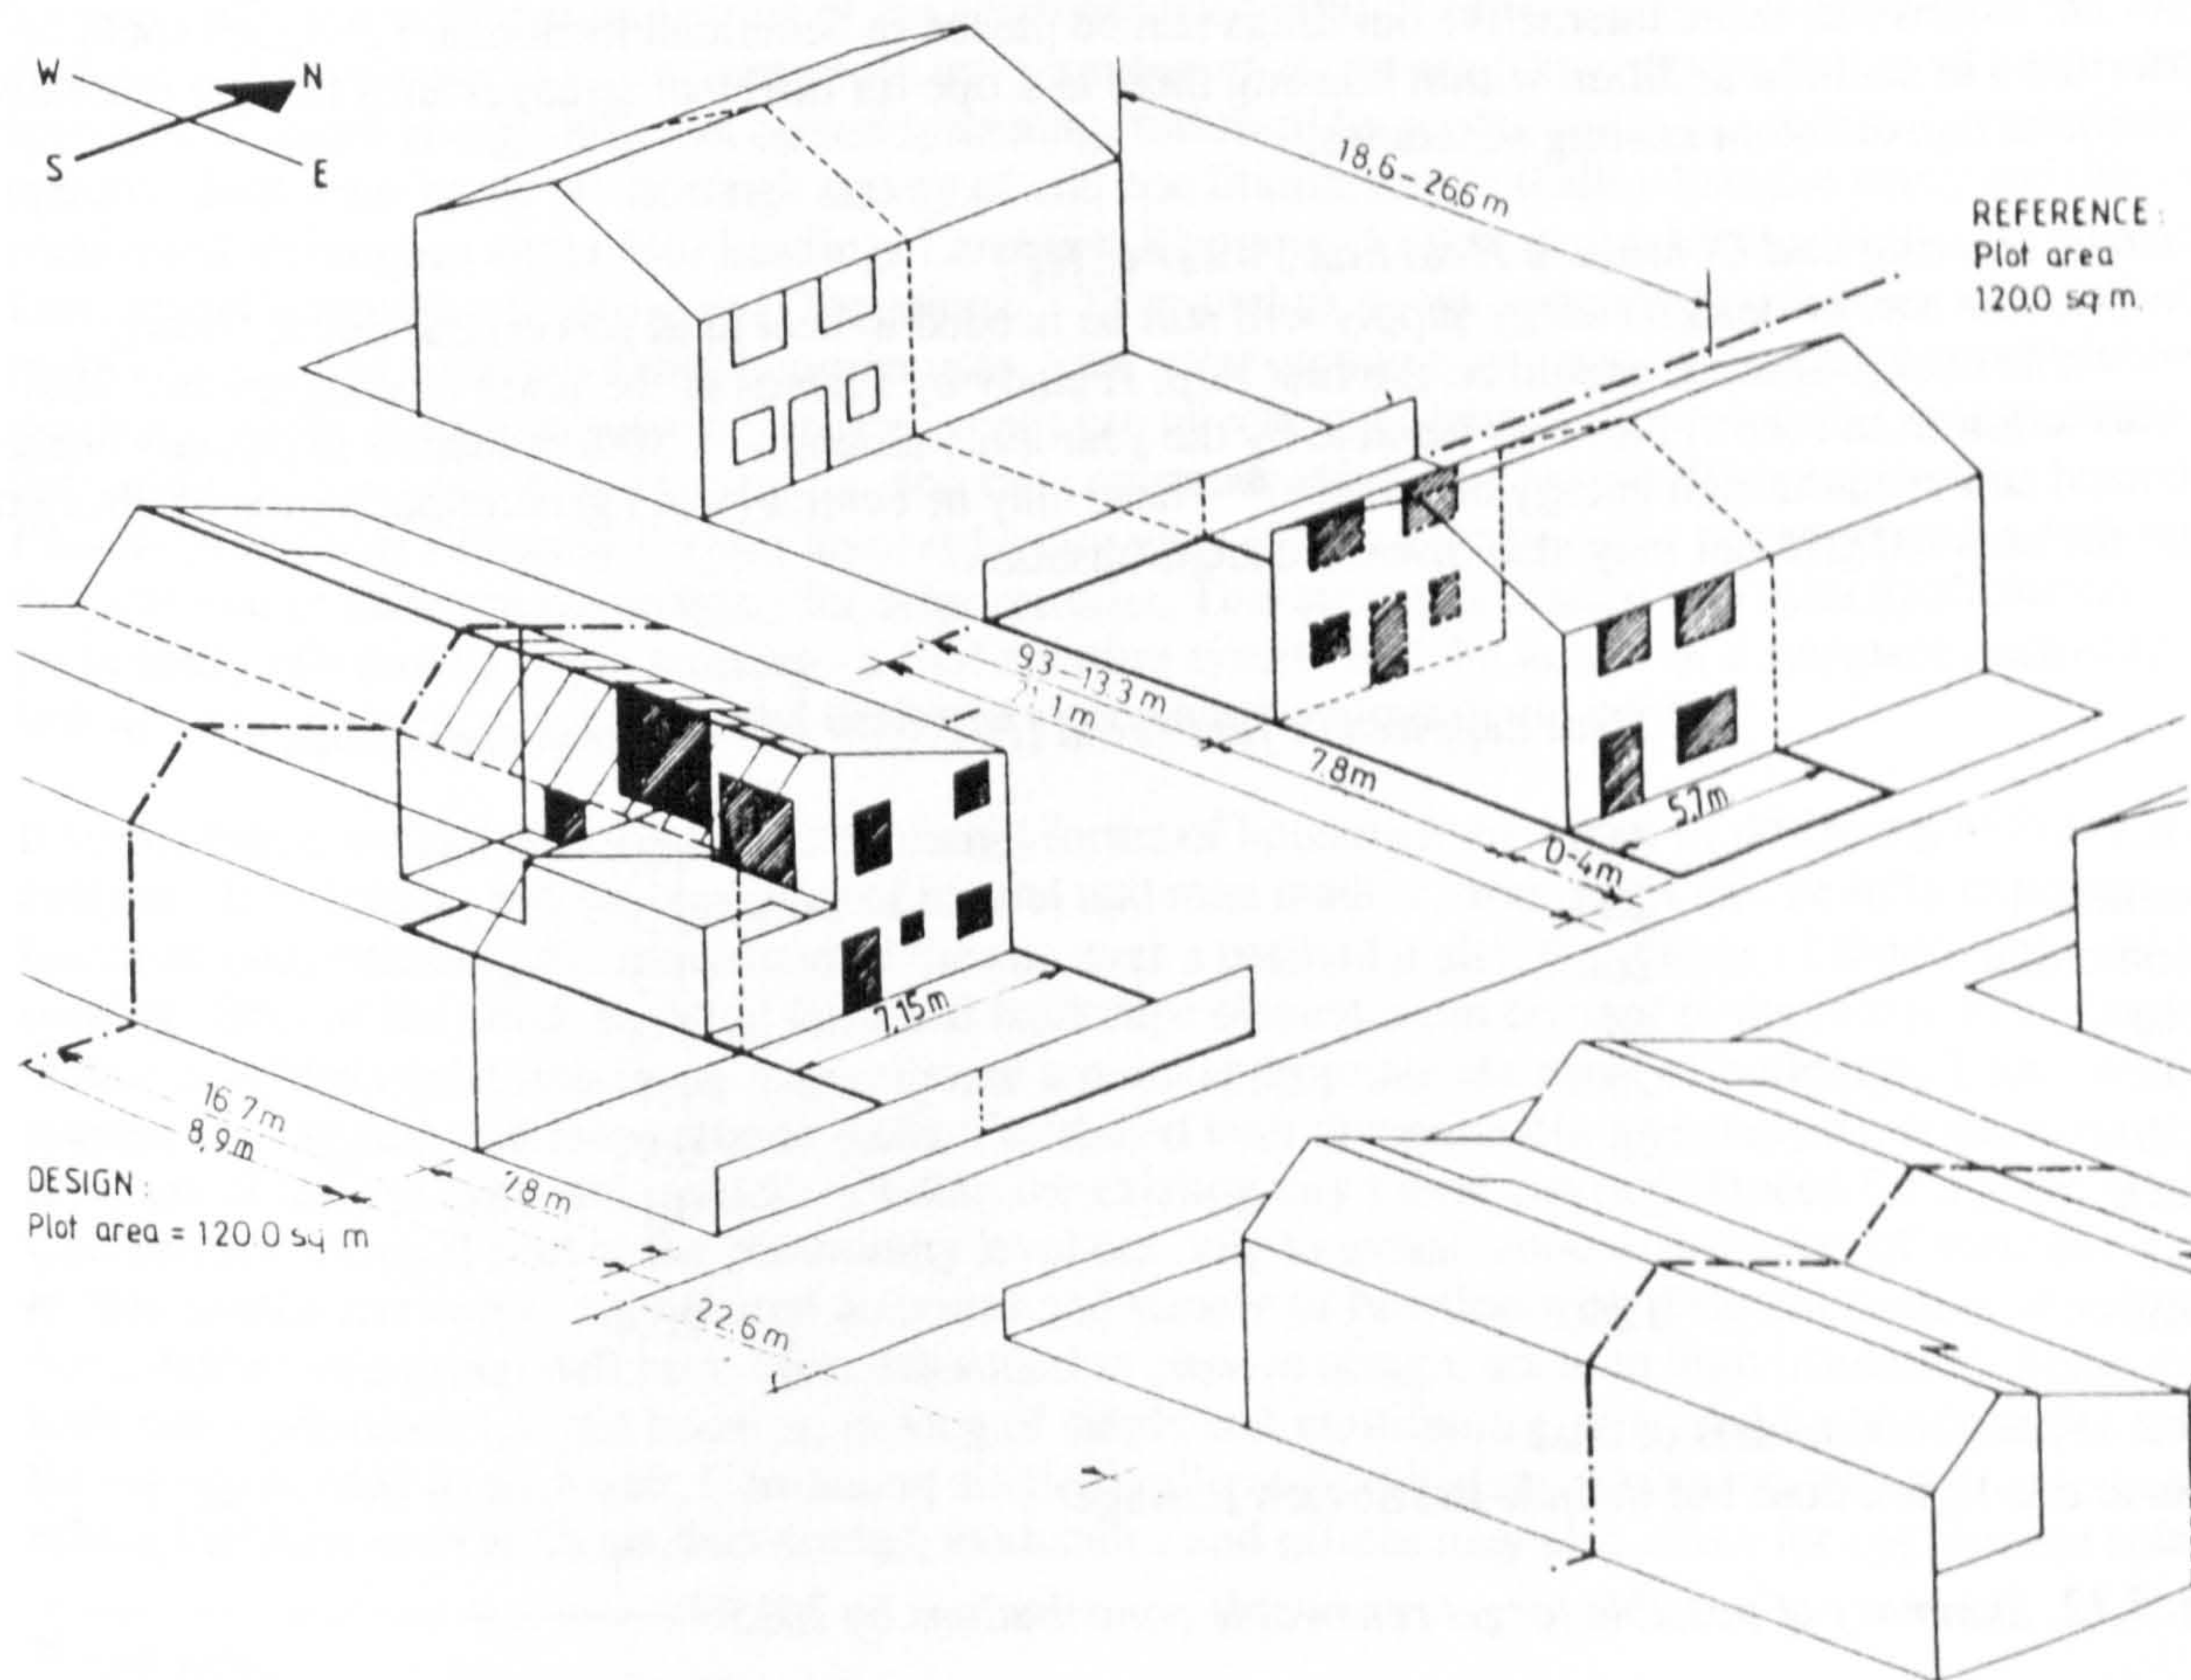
Site plan of M/N design<sup>61</sup>
